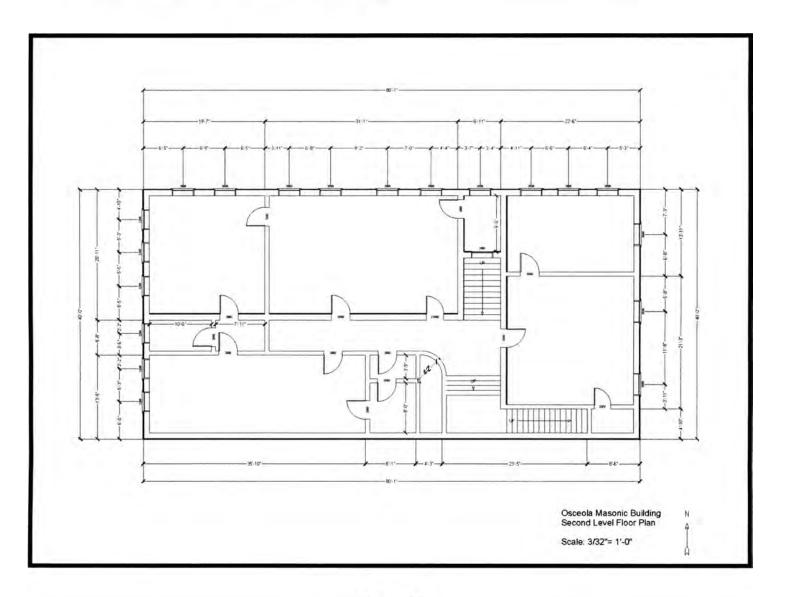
Second Floor Plan Offices (Ryan Lundquist Plan, 2009)
